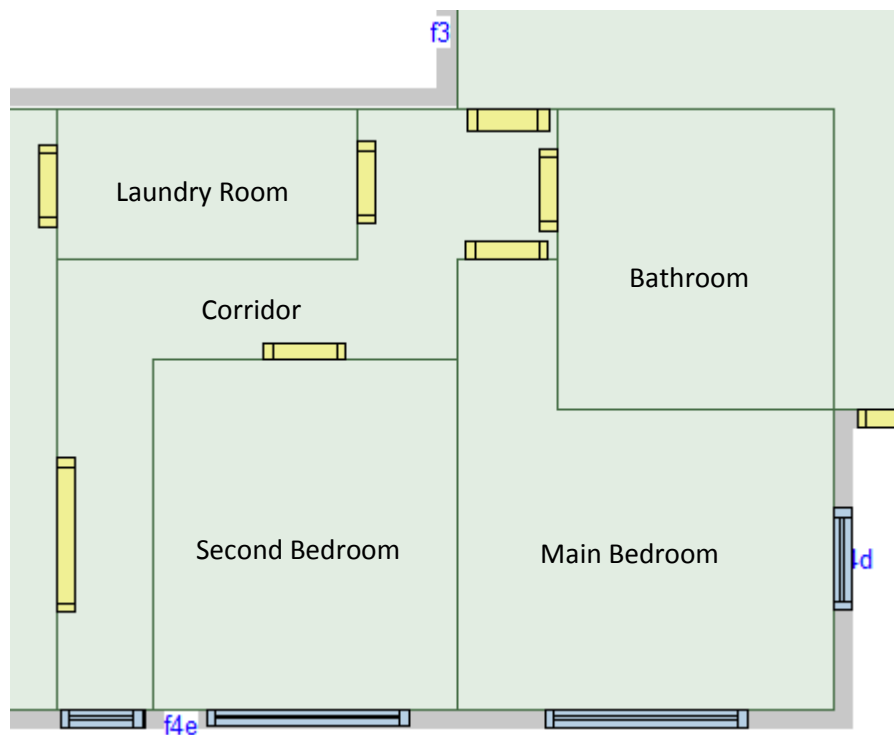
Main bedroom, second room, laundry room, bathroom and corridor layout.
